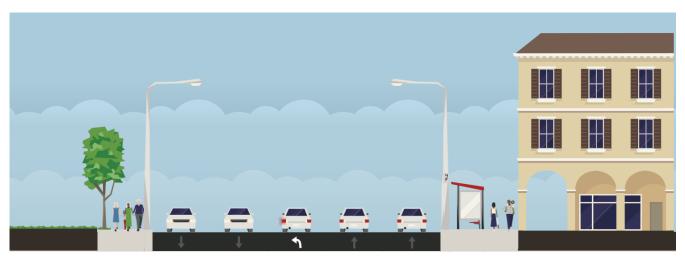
114 Street Facing North (South of 87 Avenue)
